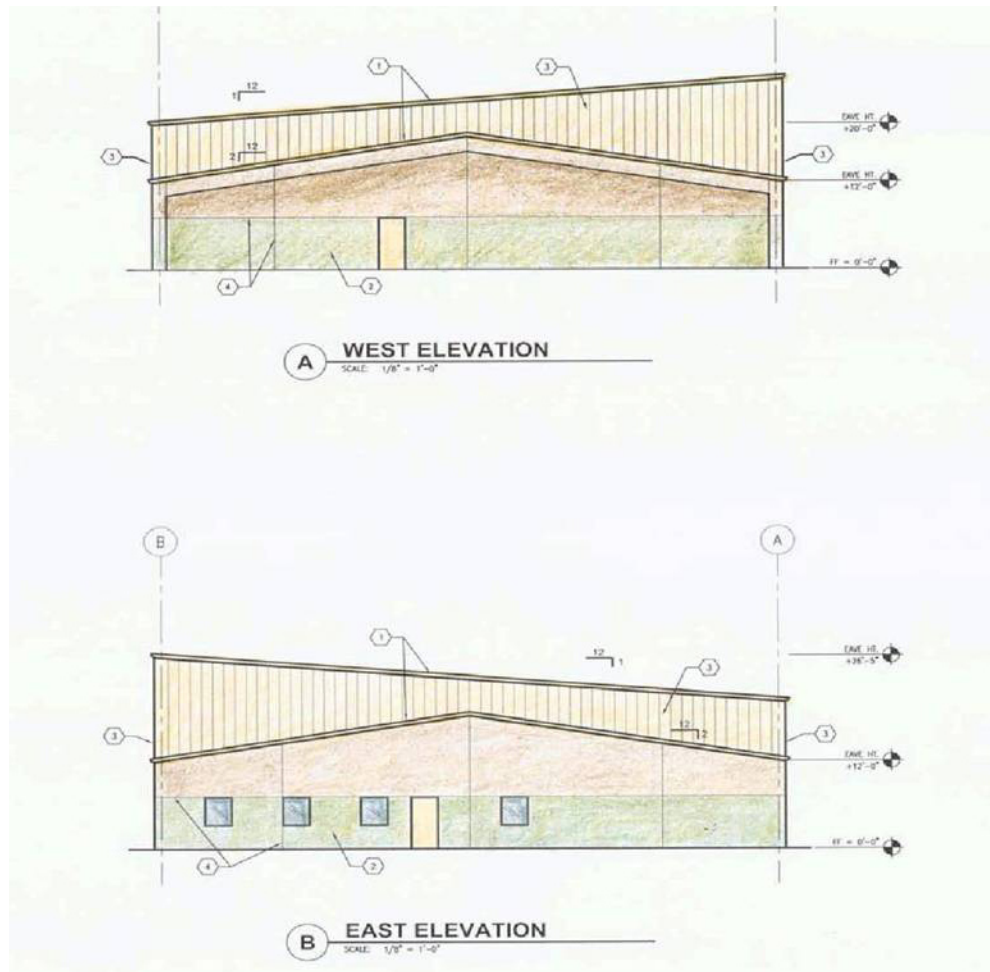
West and East (facing toward Runway) Elevations of Proposed Aircraft Rescue and Fire-Fighting Facility
